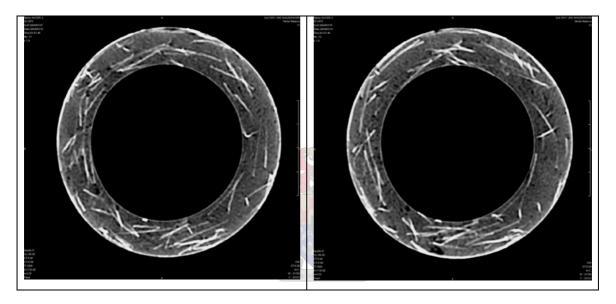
CT scan images of auger extruded steel fibre reinforced ECC pipe
